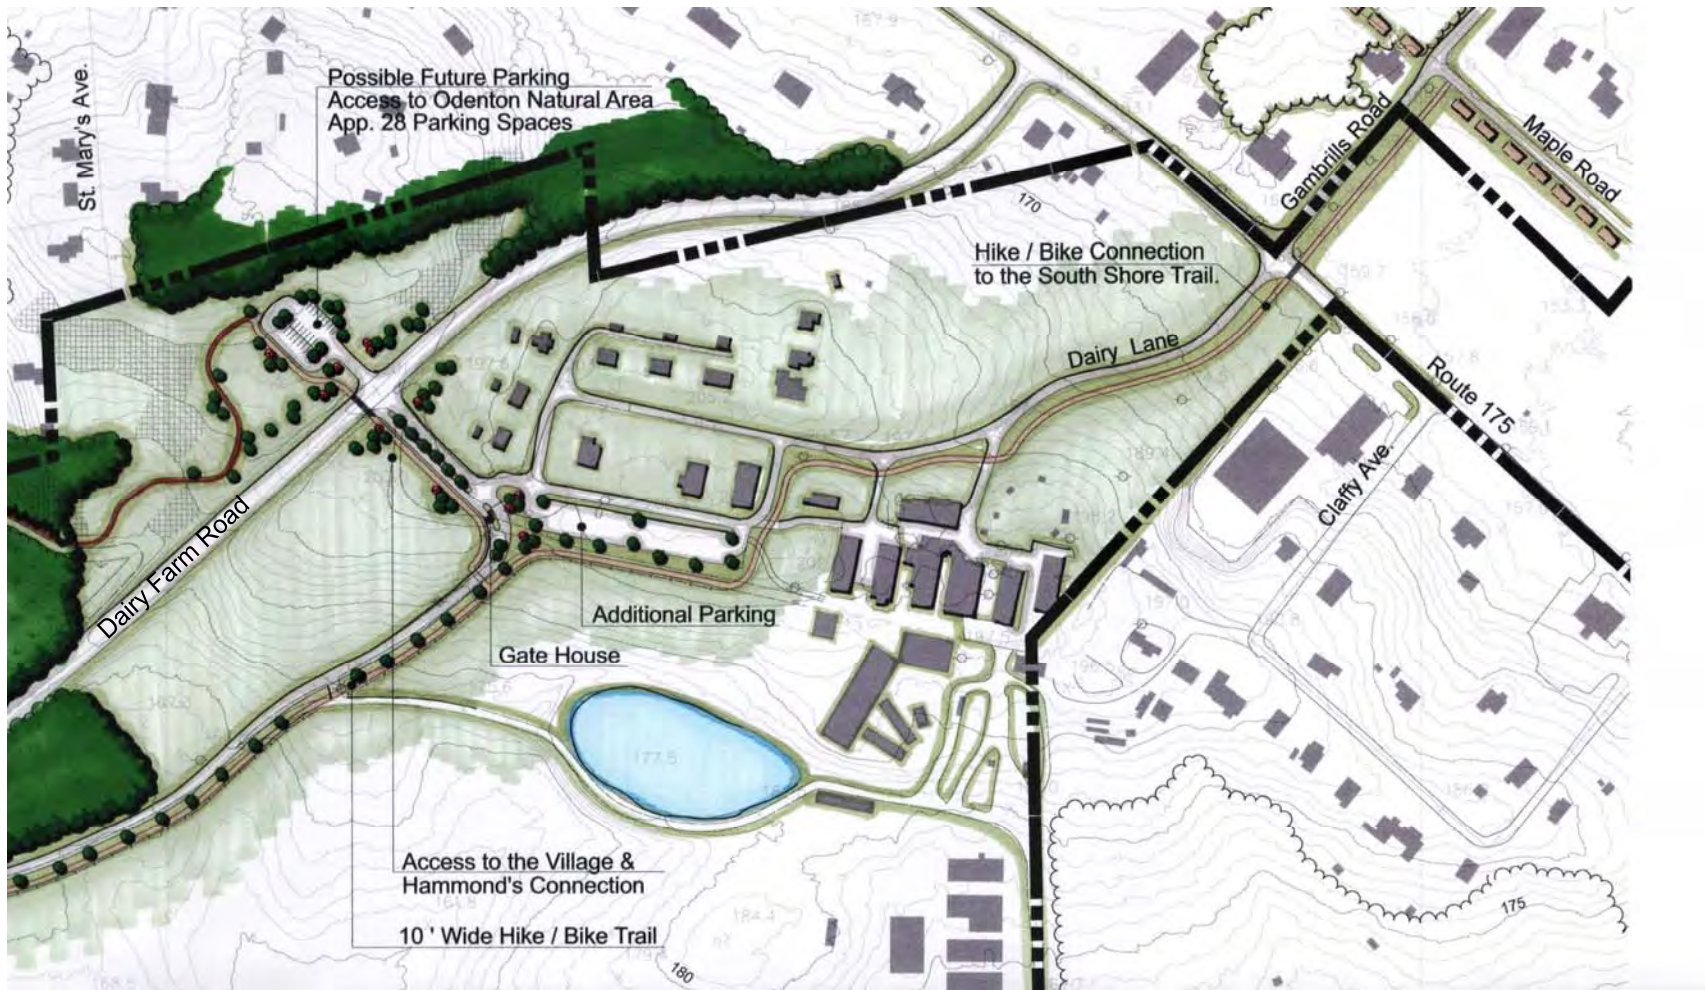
Proposed public access to Hammond's Connection and the Village. Cars would enter via Dairy Farm Road while bicyclists and hikers would enter from either Dairy Farm Road or the South Shore Trail.
